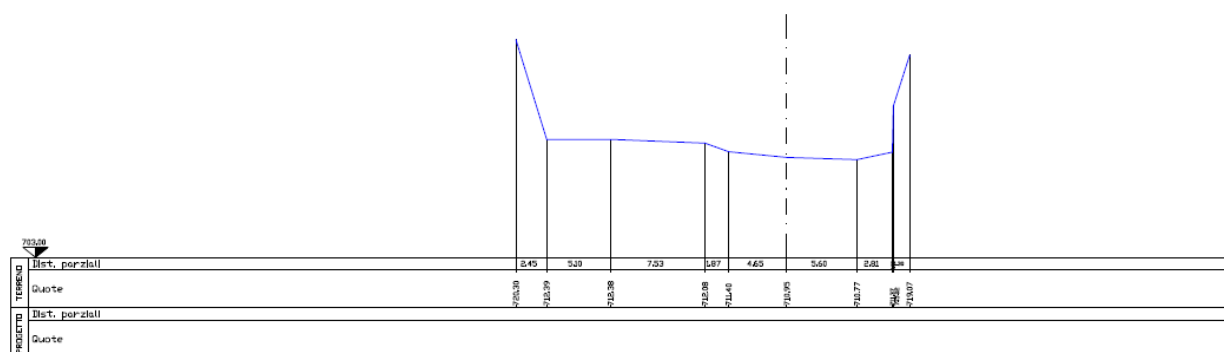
Cross section of the Piave river, progressive 4200 m.
